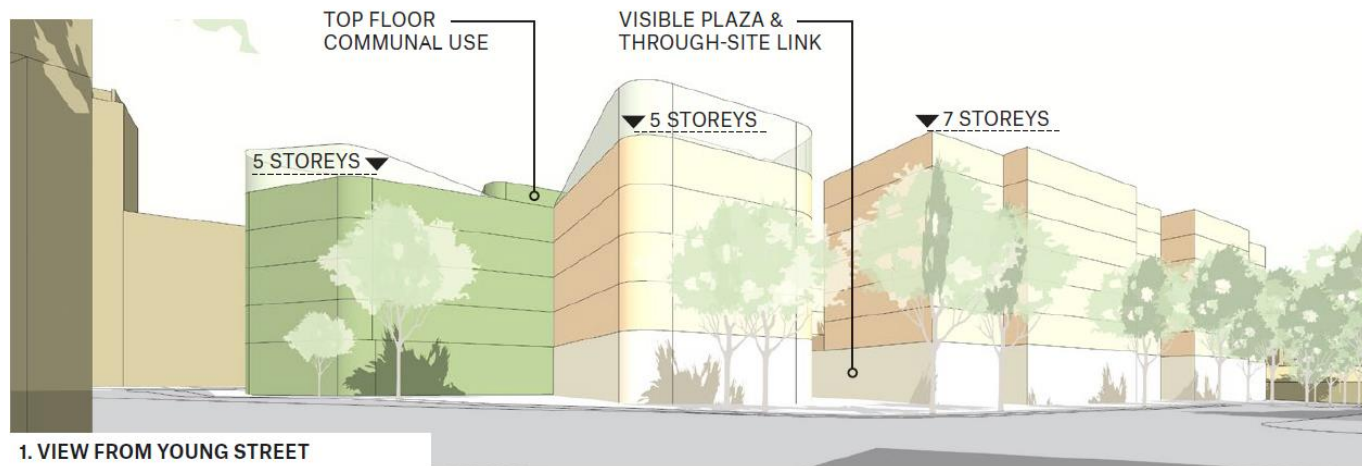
Proposed massing viewed from the Young Street and McEvoy Street intersection
